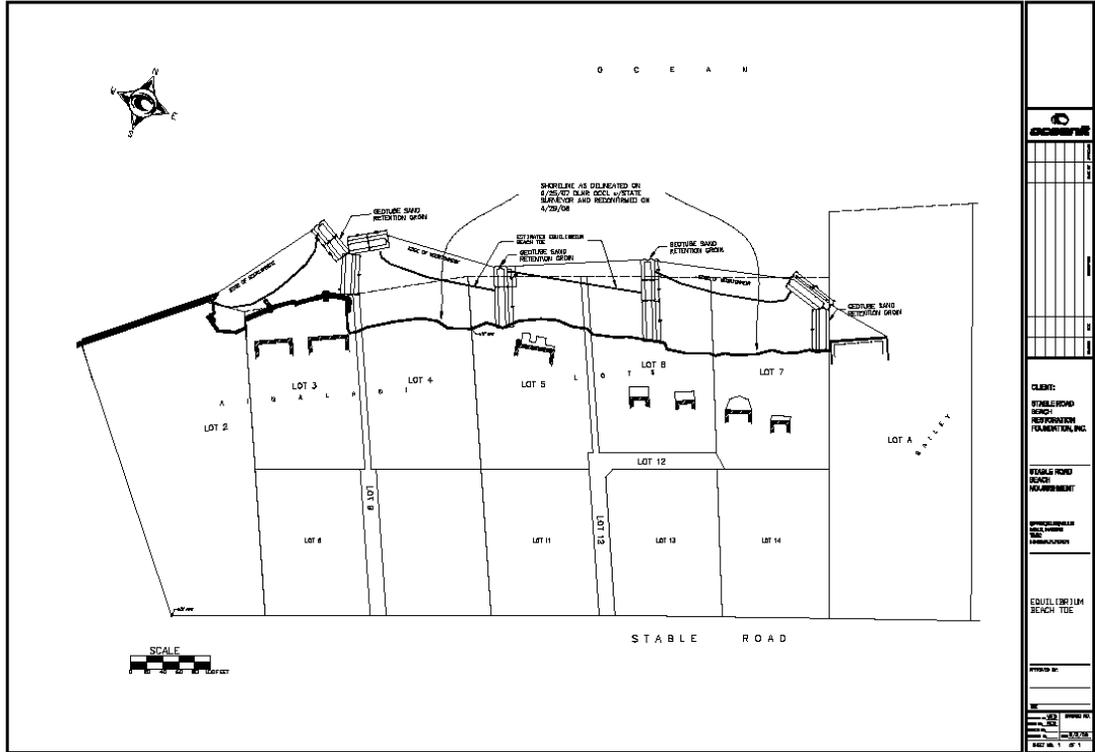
Beach Equilibrium Site Plan Prepared By Coastal Engineer
